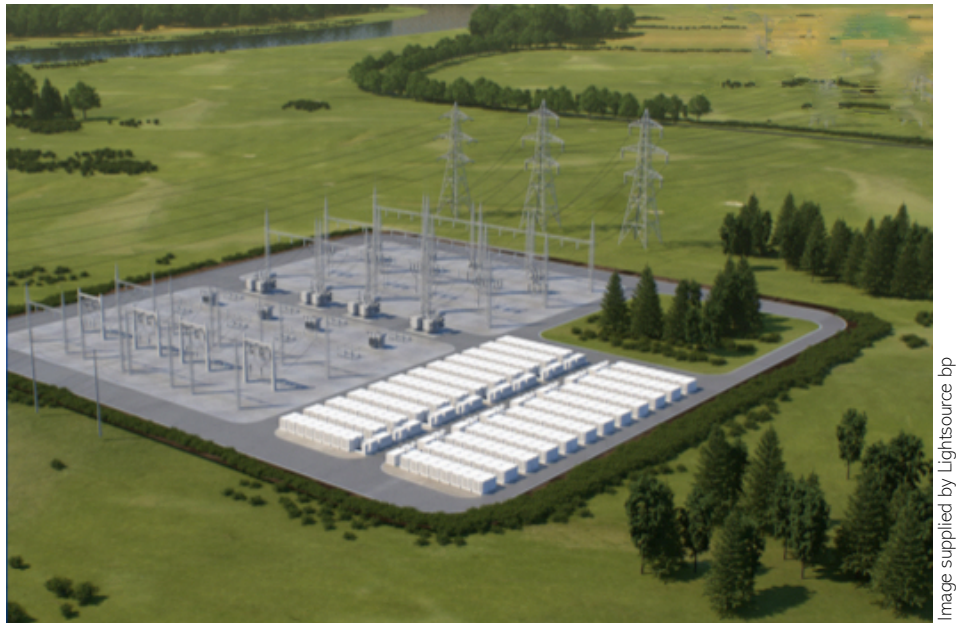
Typical BESS housing aggregated adjacent to a substation
